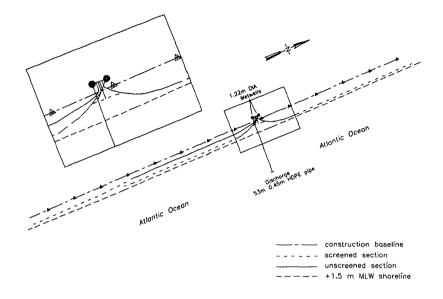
Plan-view schematic of Lighthouse North STABEACH segment.
